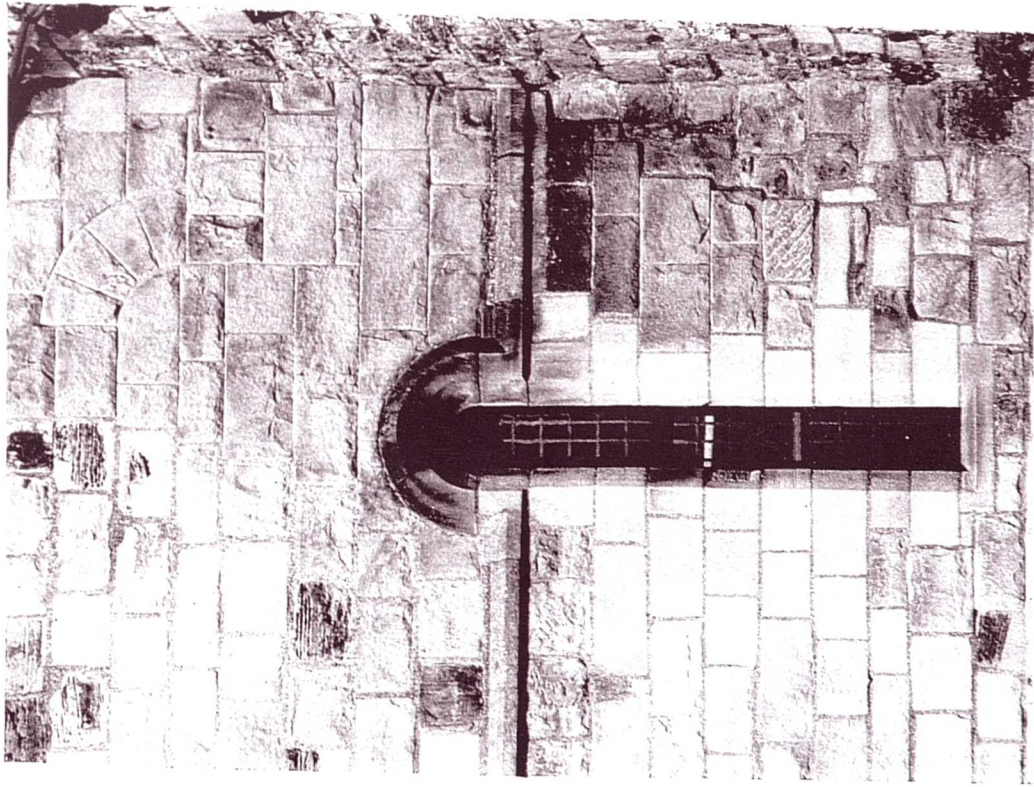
Lancet window on south wall of Kitchen Tower. The partial arch of another opening is seen above and to the right
